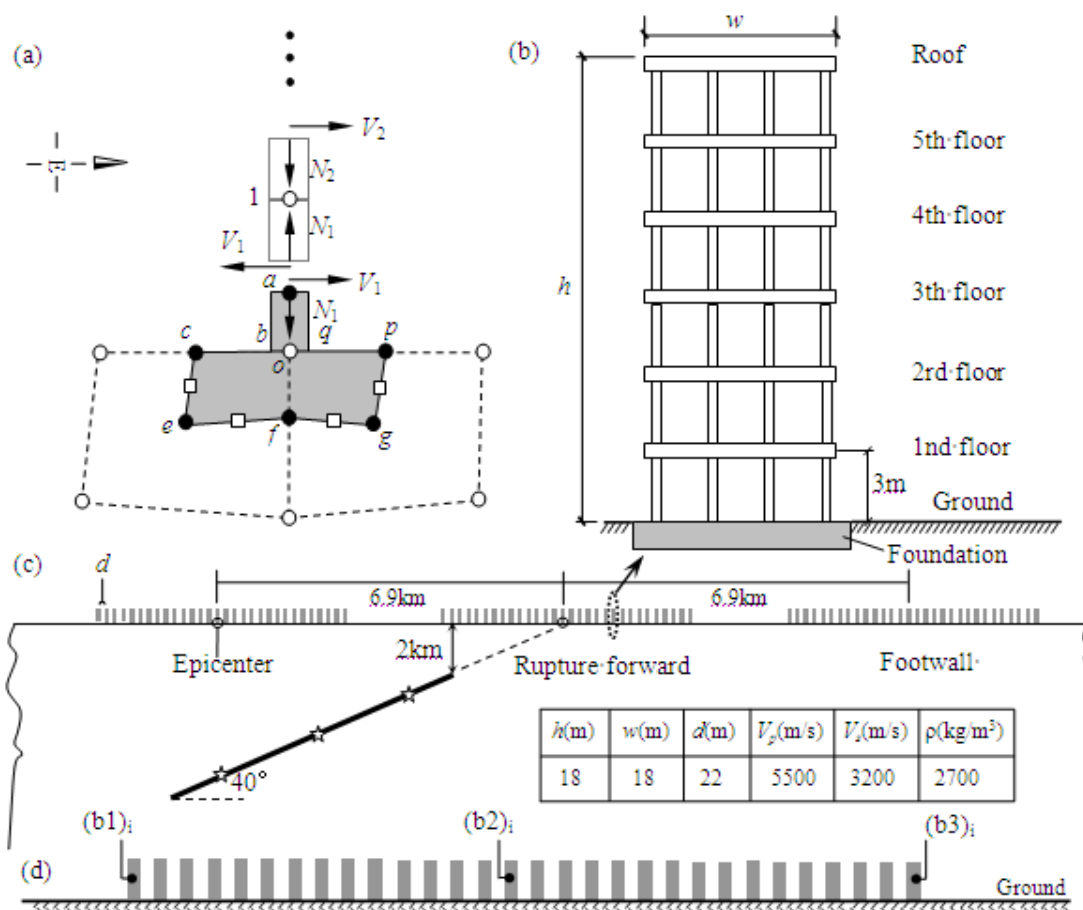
The calculation model integrated 6-storey RC frame structures, earth medium and the causative fault. (b1)_i, (b2)_i and (b3)_i are used for outputting the inter-story drifts between the second floor and third floor; Subscript $i=1$ denotes structures at the epicenter, $i=2$ for the rupture forward and $i=3$ for the footwall.
